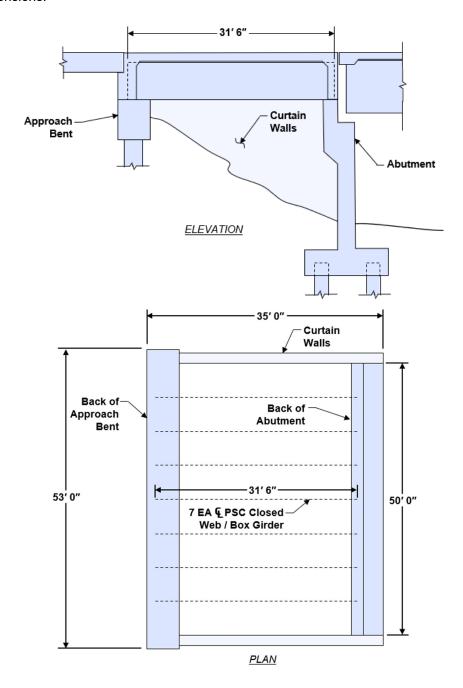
Elevation and Plan View for Concrete Vaulted Abutment Example
